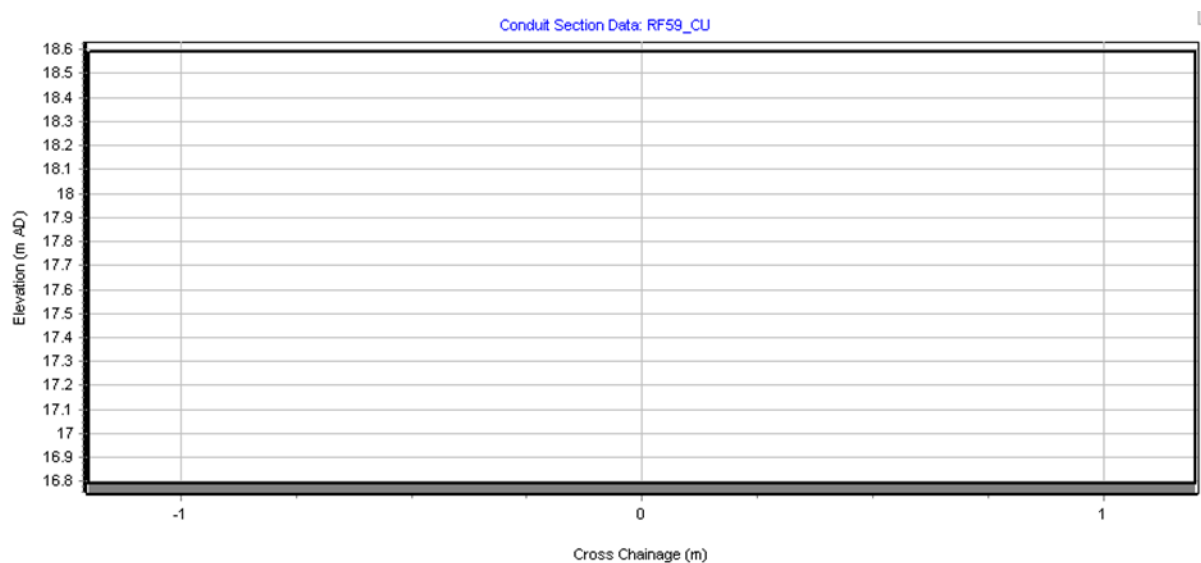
Rectory Brook Modelled Proposed A428 Culvert (dimensions not to scale)
